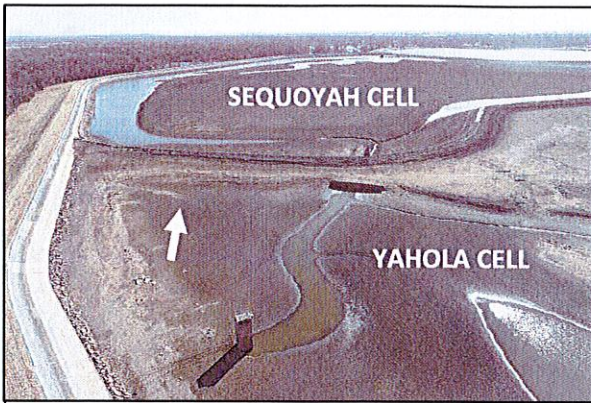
showing the existing perimeter road and existing slope walls adjacent to the West Gate Berm Structure. White arrow shows approx. project location.
